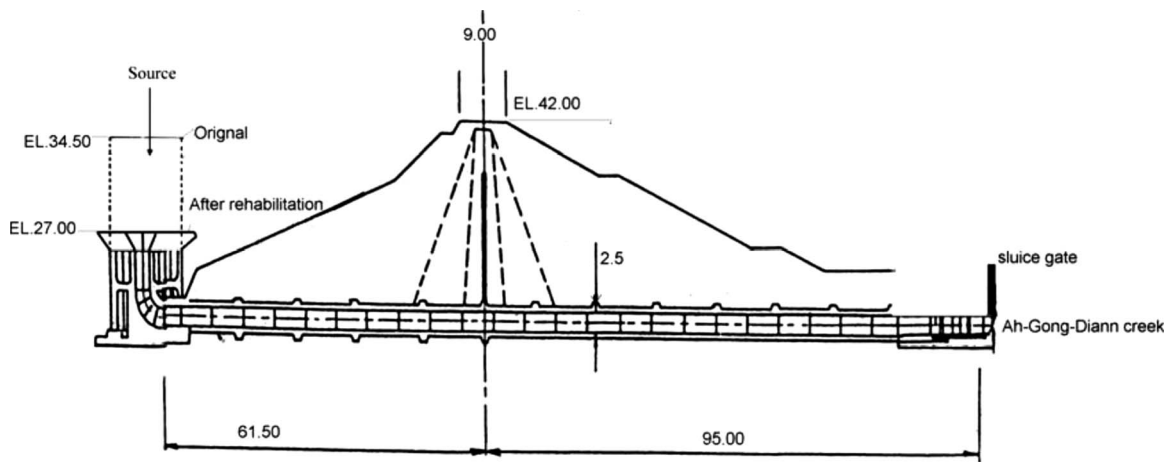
Cross-sectional layout of rehabilitation plan for bell mouth spillway
